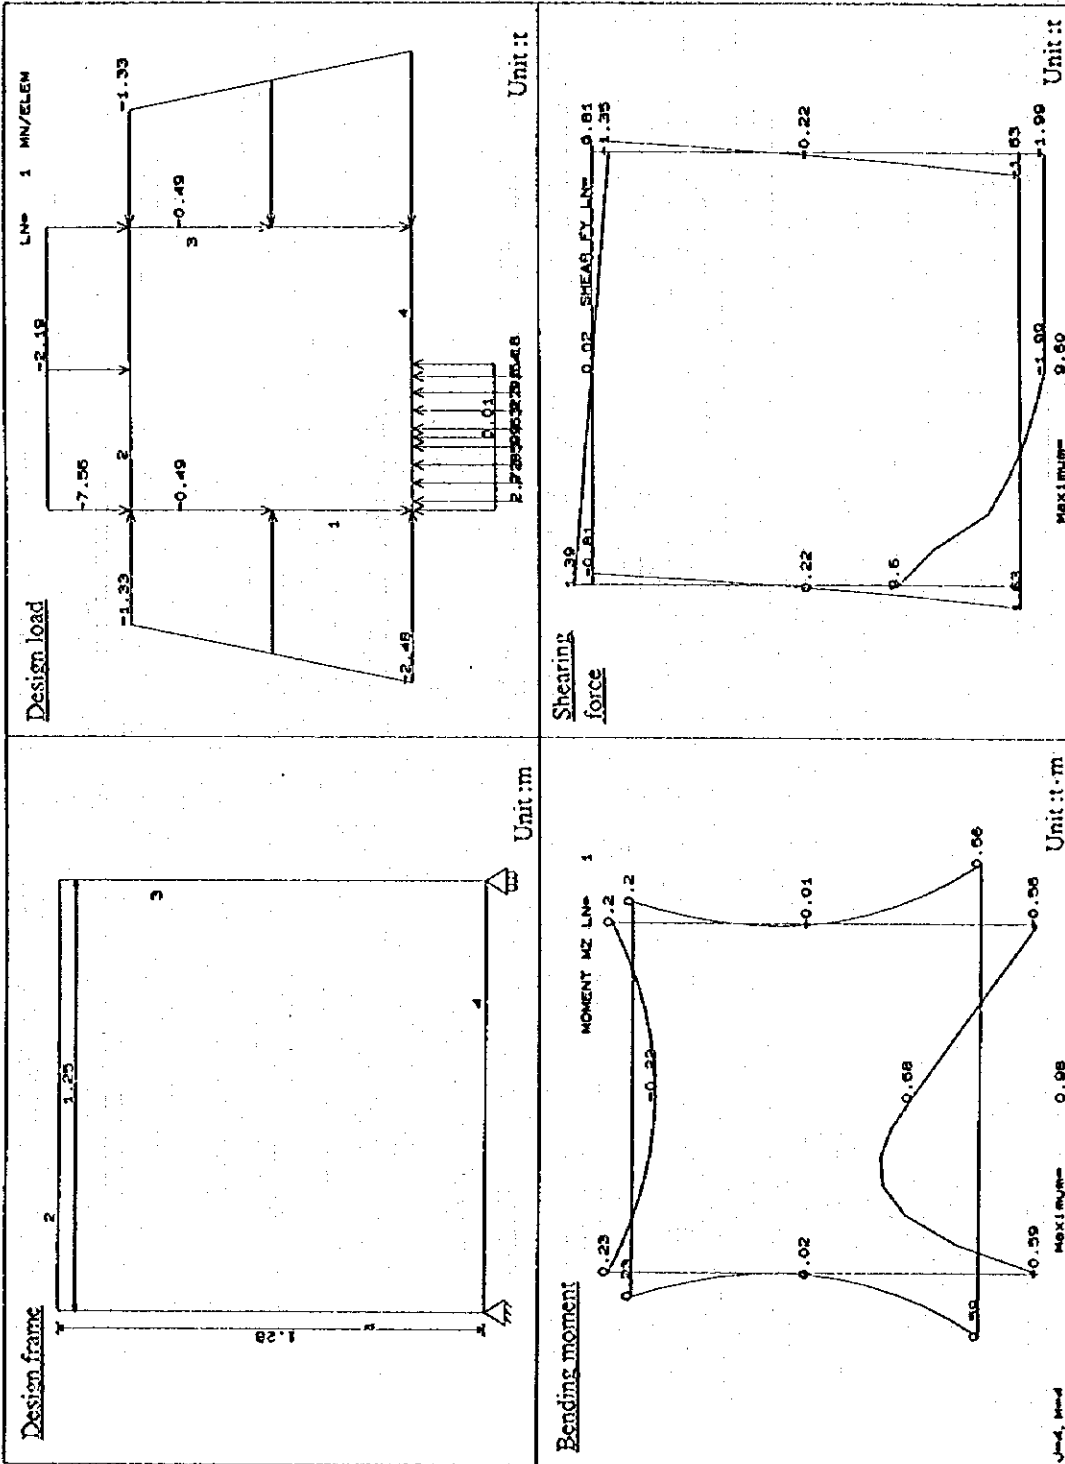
Stress Analysis on Transverse Section of Sluiceway Conduit (3/12)
